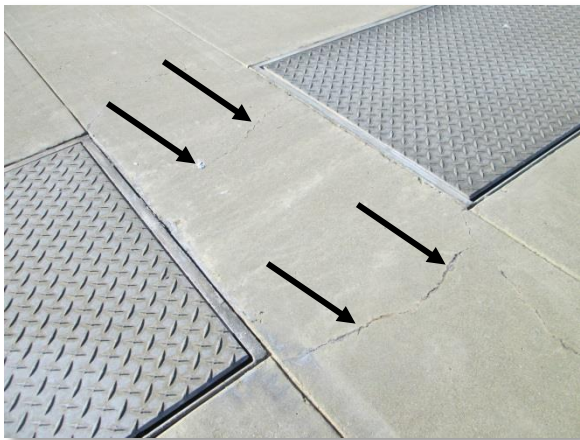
Cracking of platform above west end of SST 2 (typical).
